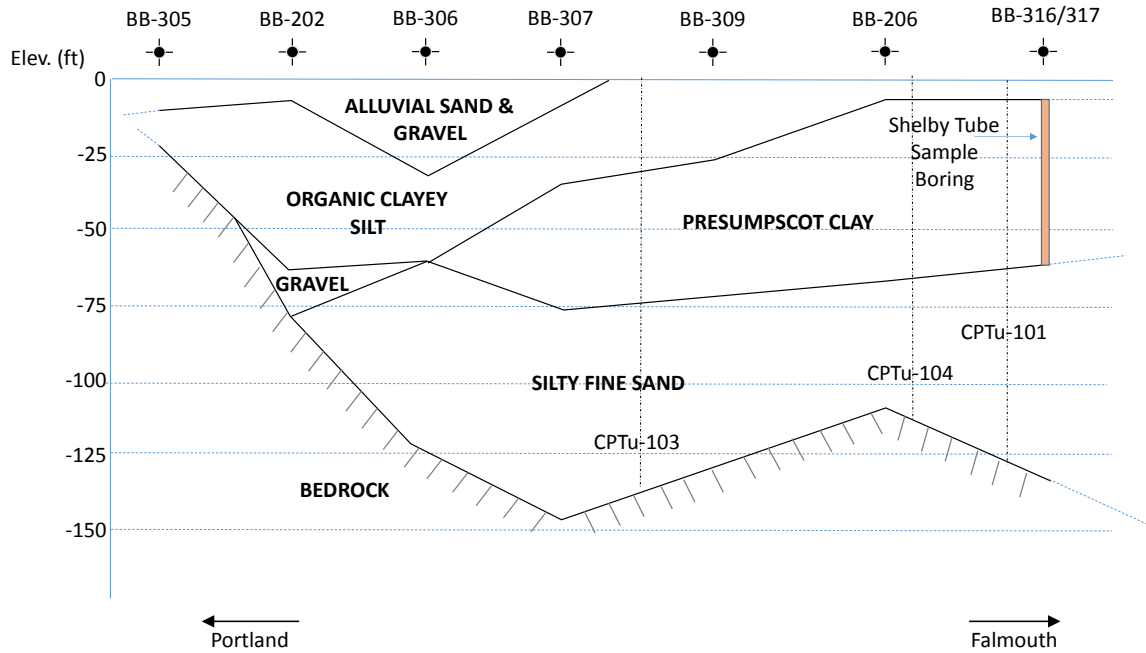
Interpreted subsurface profile from borings (Figure 5.3) conducted along the new Martin's Point Bridge alignment.
